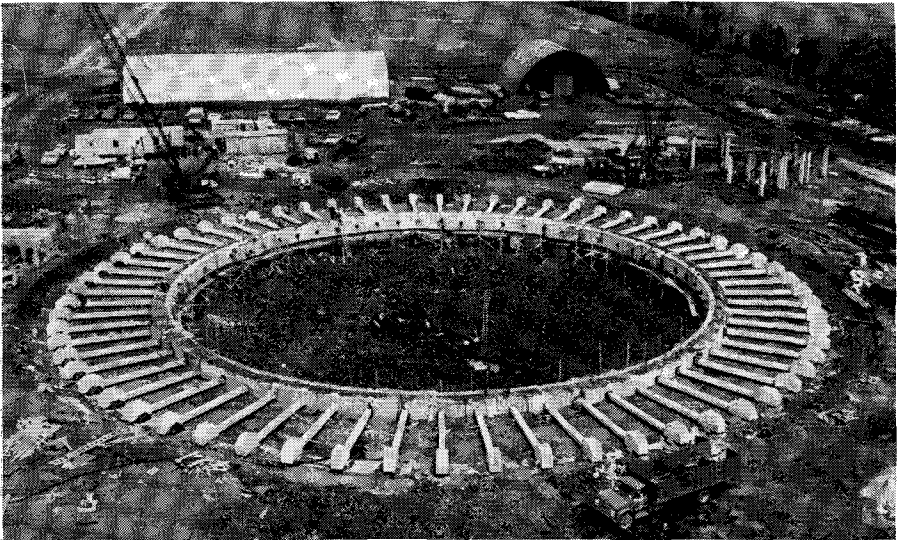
Precast post-tensioned tie beams connected to anchorage blocks and inner ring beam.
